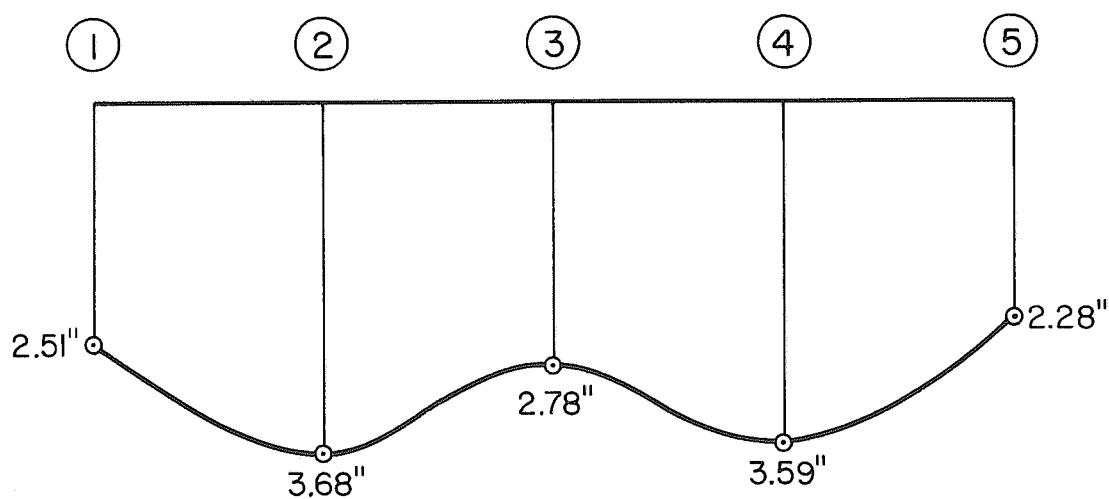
GIRDER DEFLECTIONS (INCHES) AT MIDSPAN OF SPAN II AT FAILURE LOAD (170 KIPS)
